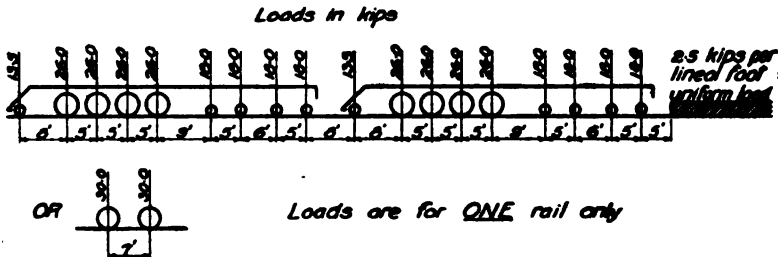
CLASS "ESPECIAL HEAVY" LOADING, DOMINION GOVERNMENT SPECIFICATION, 1908.
